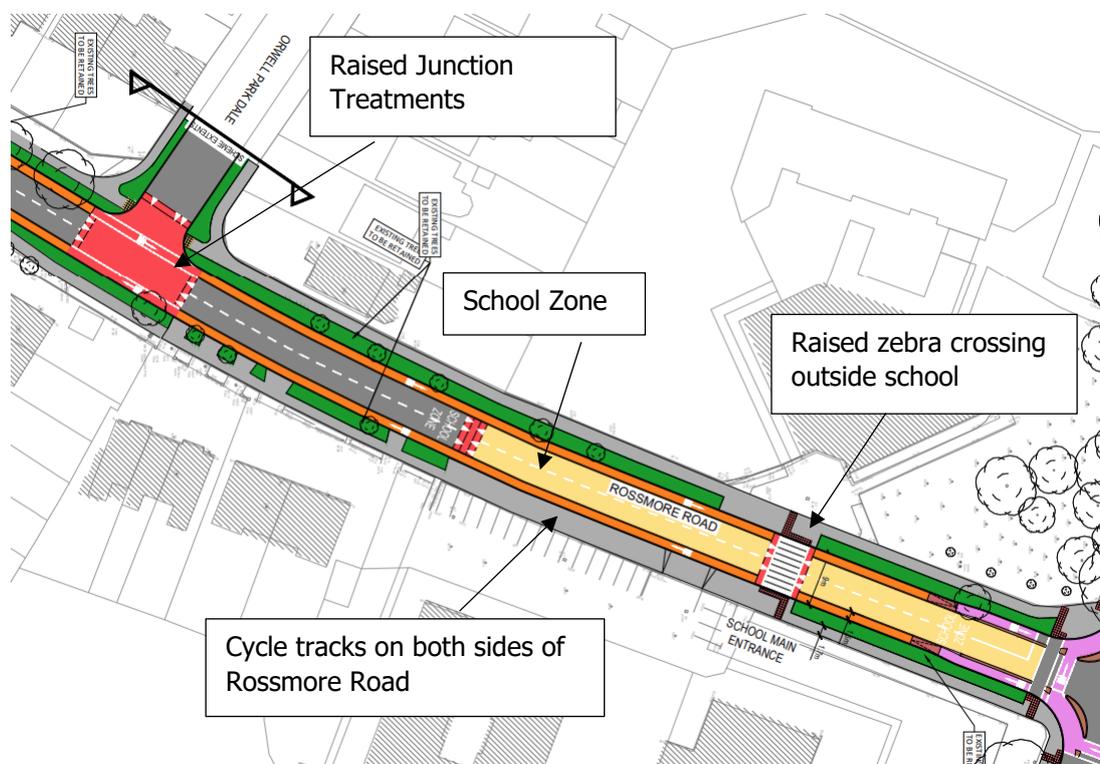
Proposed School Zone outside Bishop Galvin & Shanahan School
